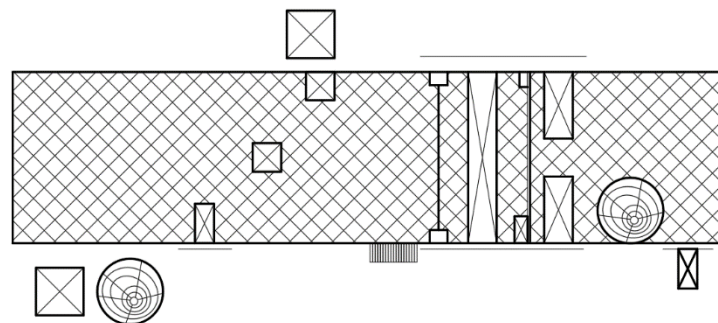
Possible position of wooden elements in a non-load-bearing straw bale walls. Based on Márton et al., (2014)
